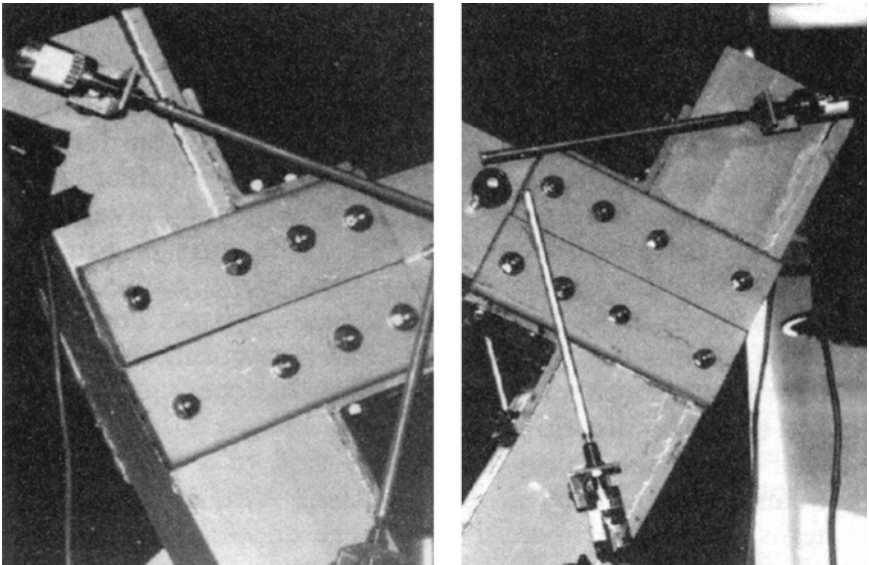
Ultimate failure mode due to web-flange separation at the column section.
